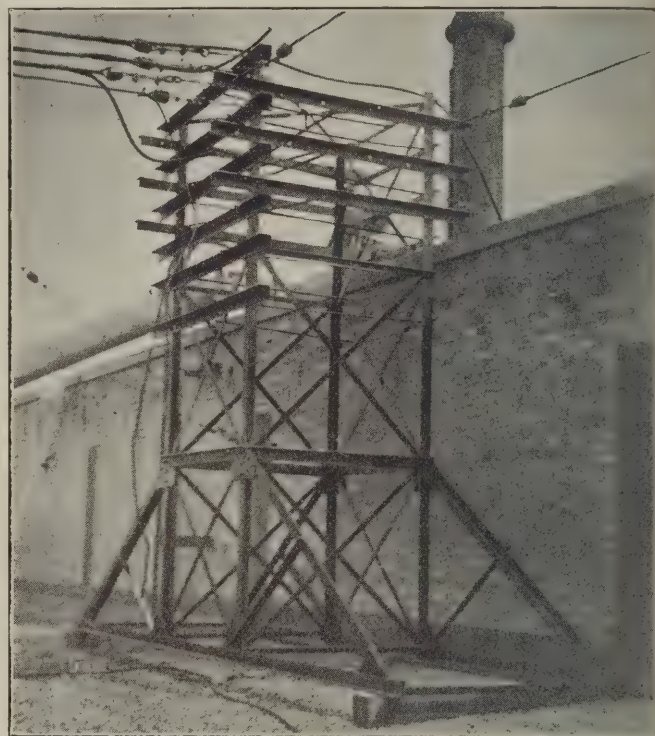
Showing "B" Tower As Indicated in Plan, Fig. 1
